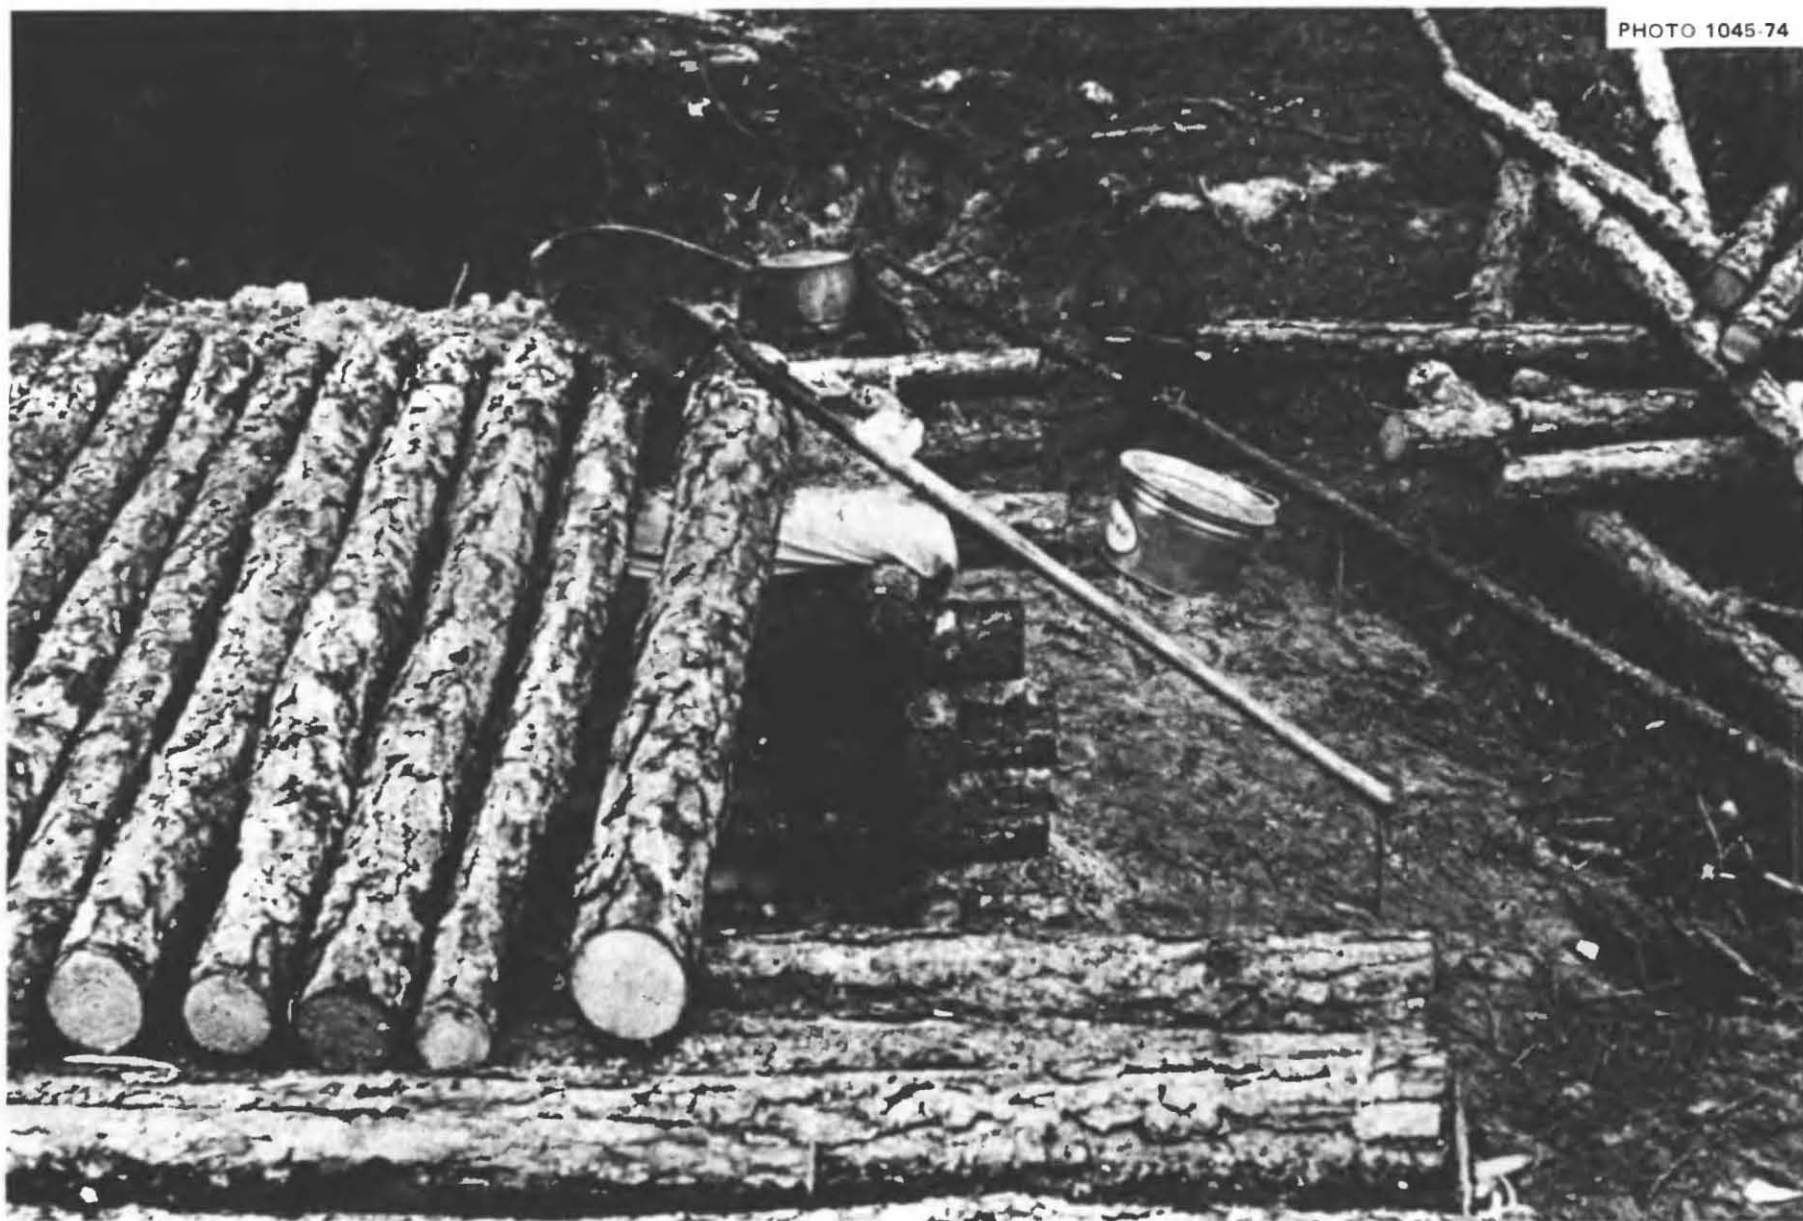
View looking down on the same entryway, after it had been filled with earth to a height of about 3 in. above the uppermost poles of the crib, and roofing poles had been placed in position. Note that the roofing poles across the entryway rest with their ends on the earth that fills the crib, and also on the outermost poles that rest on earth in a crib (not shown in this view) forming the inner side of the entry. The outermost roofing pole of the entryway had not yet been placed.
